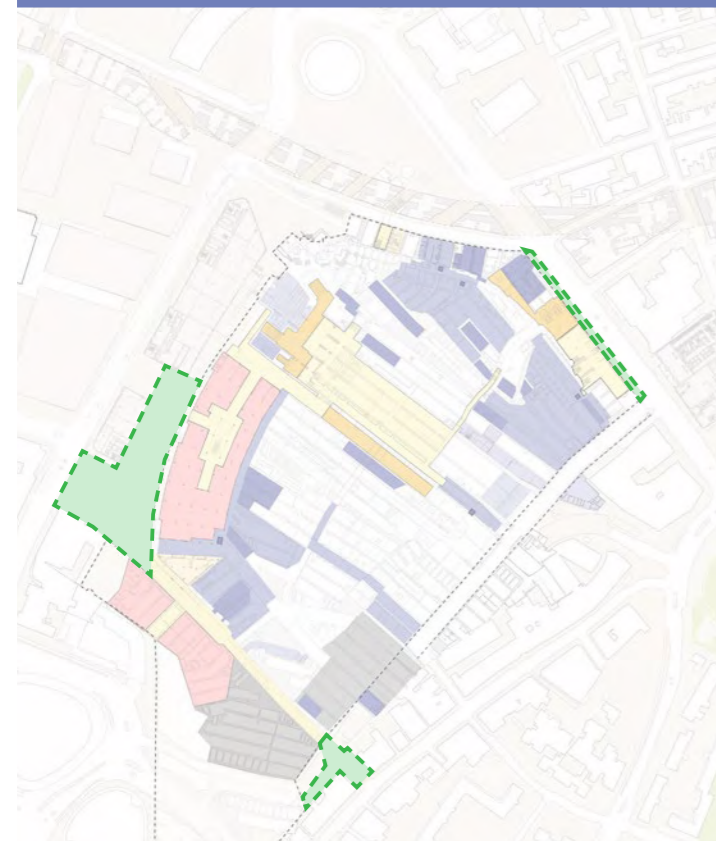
Grade / Undercrofts Level Sketch Plan
